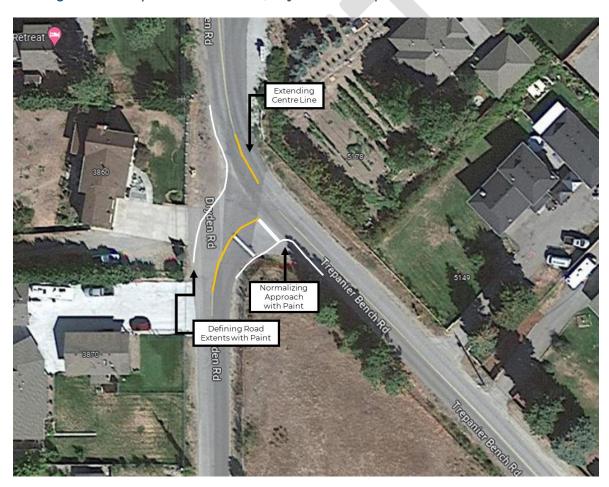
Trepanier Bench Road / Dryden Road Improvement Recommendations
